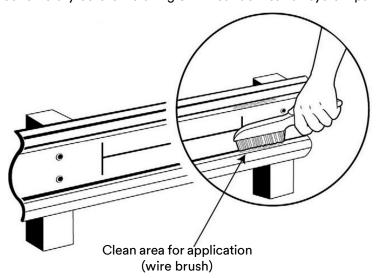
Clean guardrail first with wire brush, then with rubbing alcohol or isopropyl alcohol. Allow alcohol to dry before installing panel.
